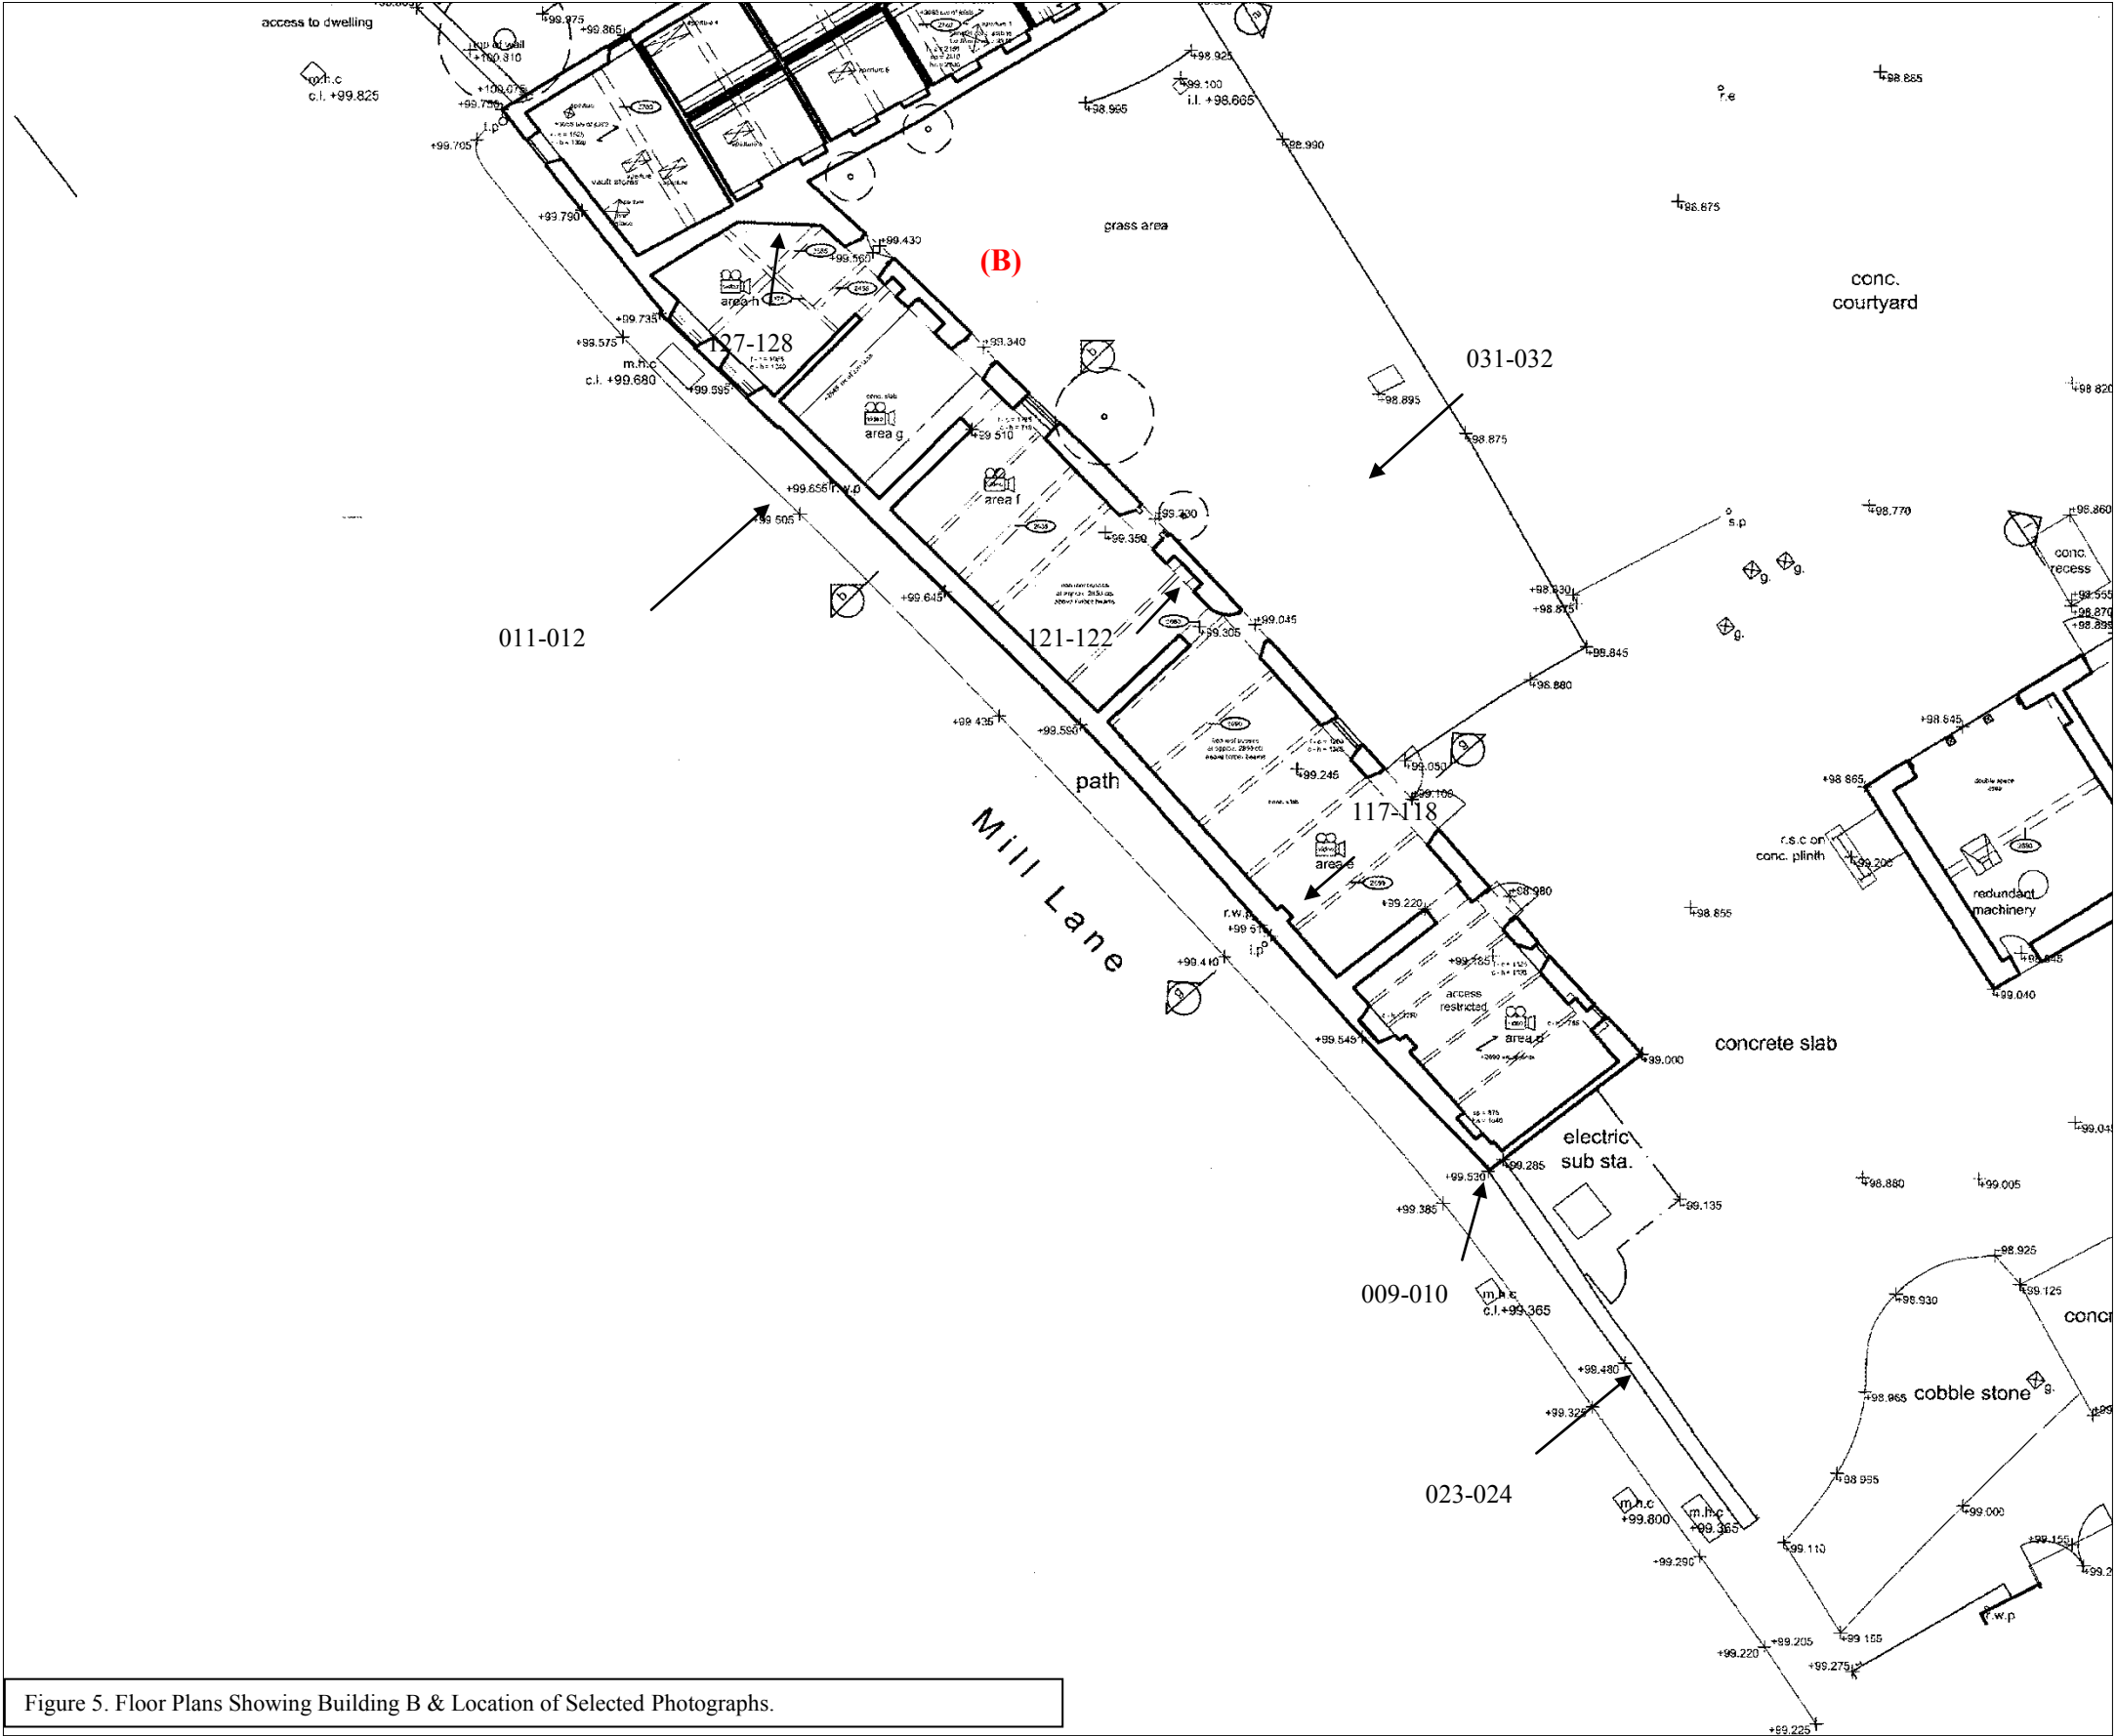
Floor Plans Showing Building B & Location of Selected Photographs.
